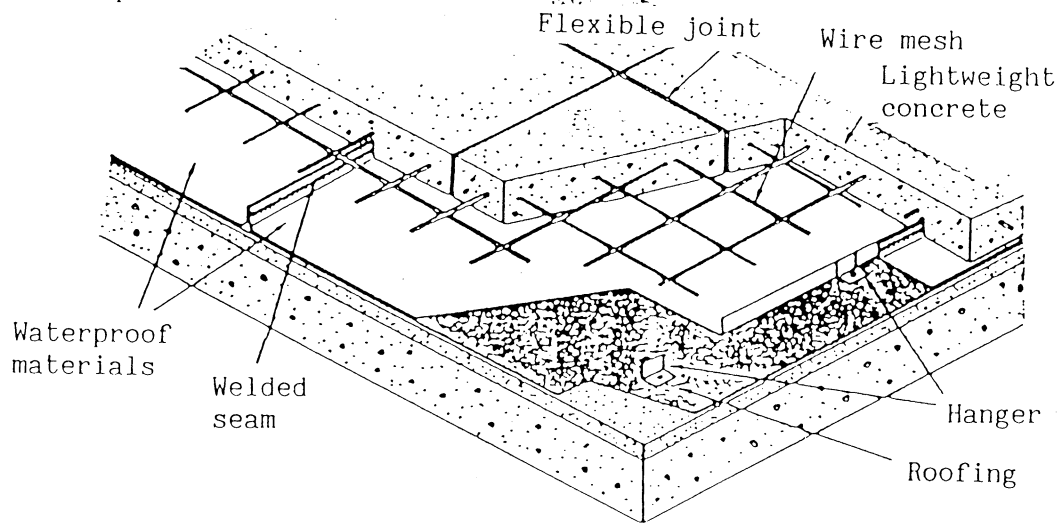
Typical Cross-sections of Waterproof Weldable RCSS
